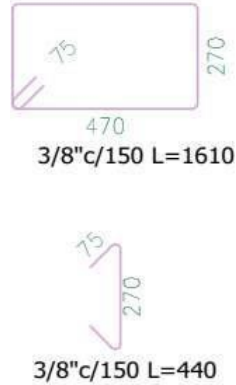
Dimensions of the stirrups used to reinforce the columns.
